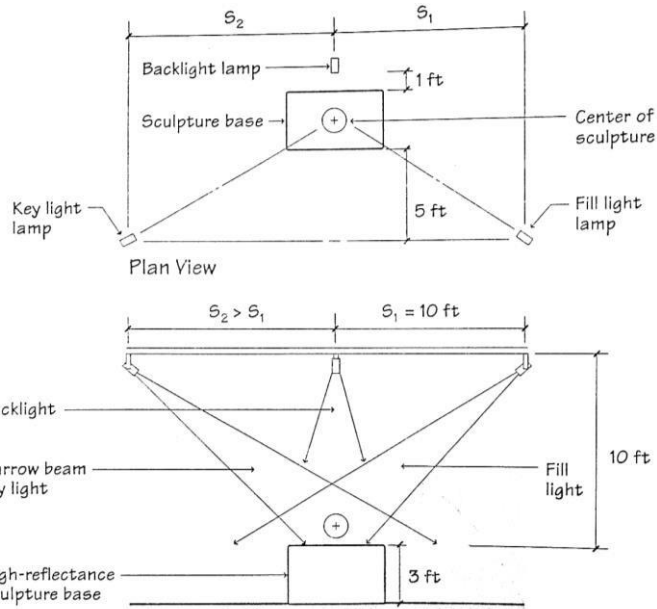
Artificial lighting for 3-D object, plan and elevation
